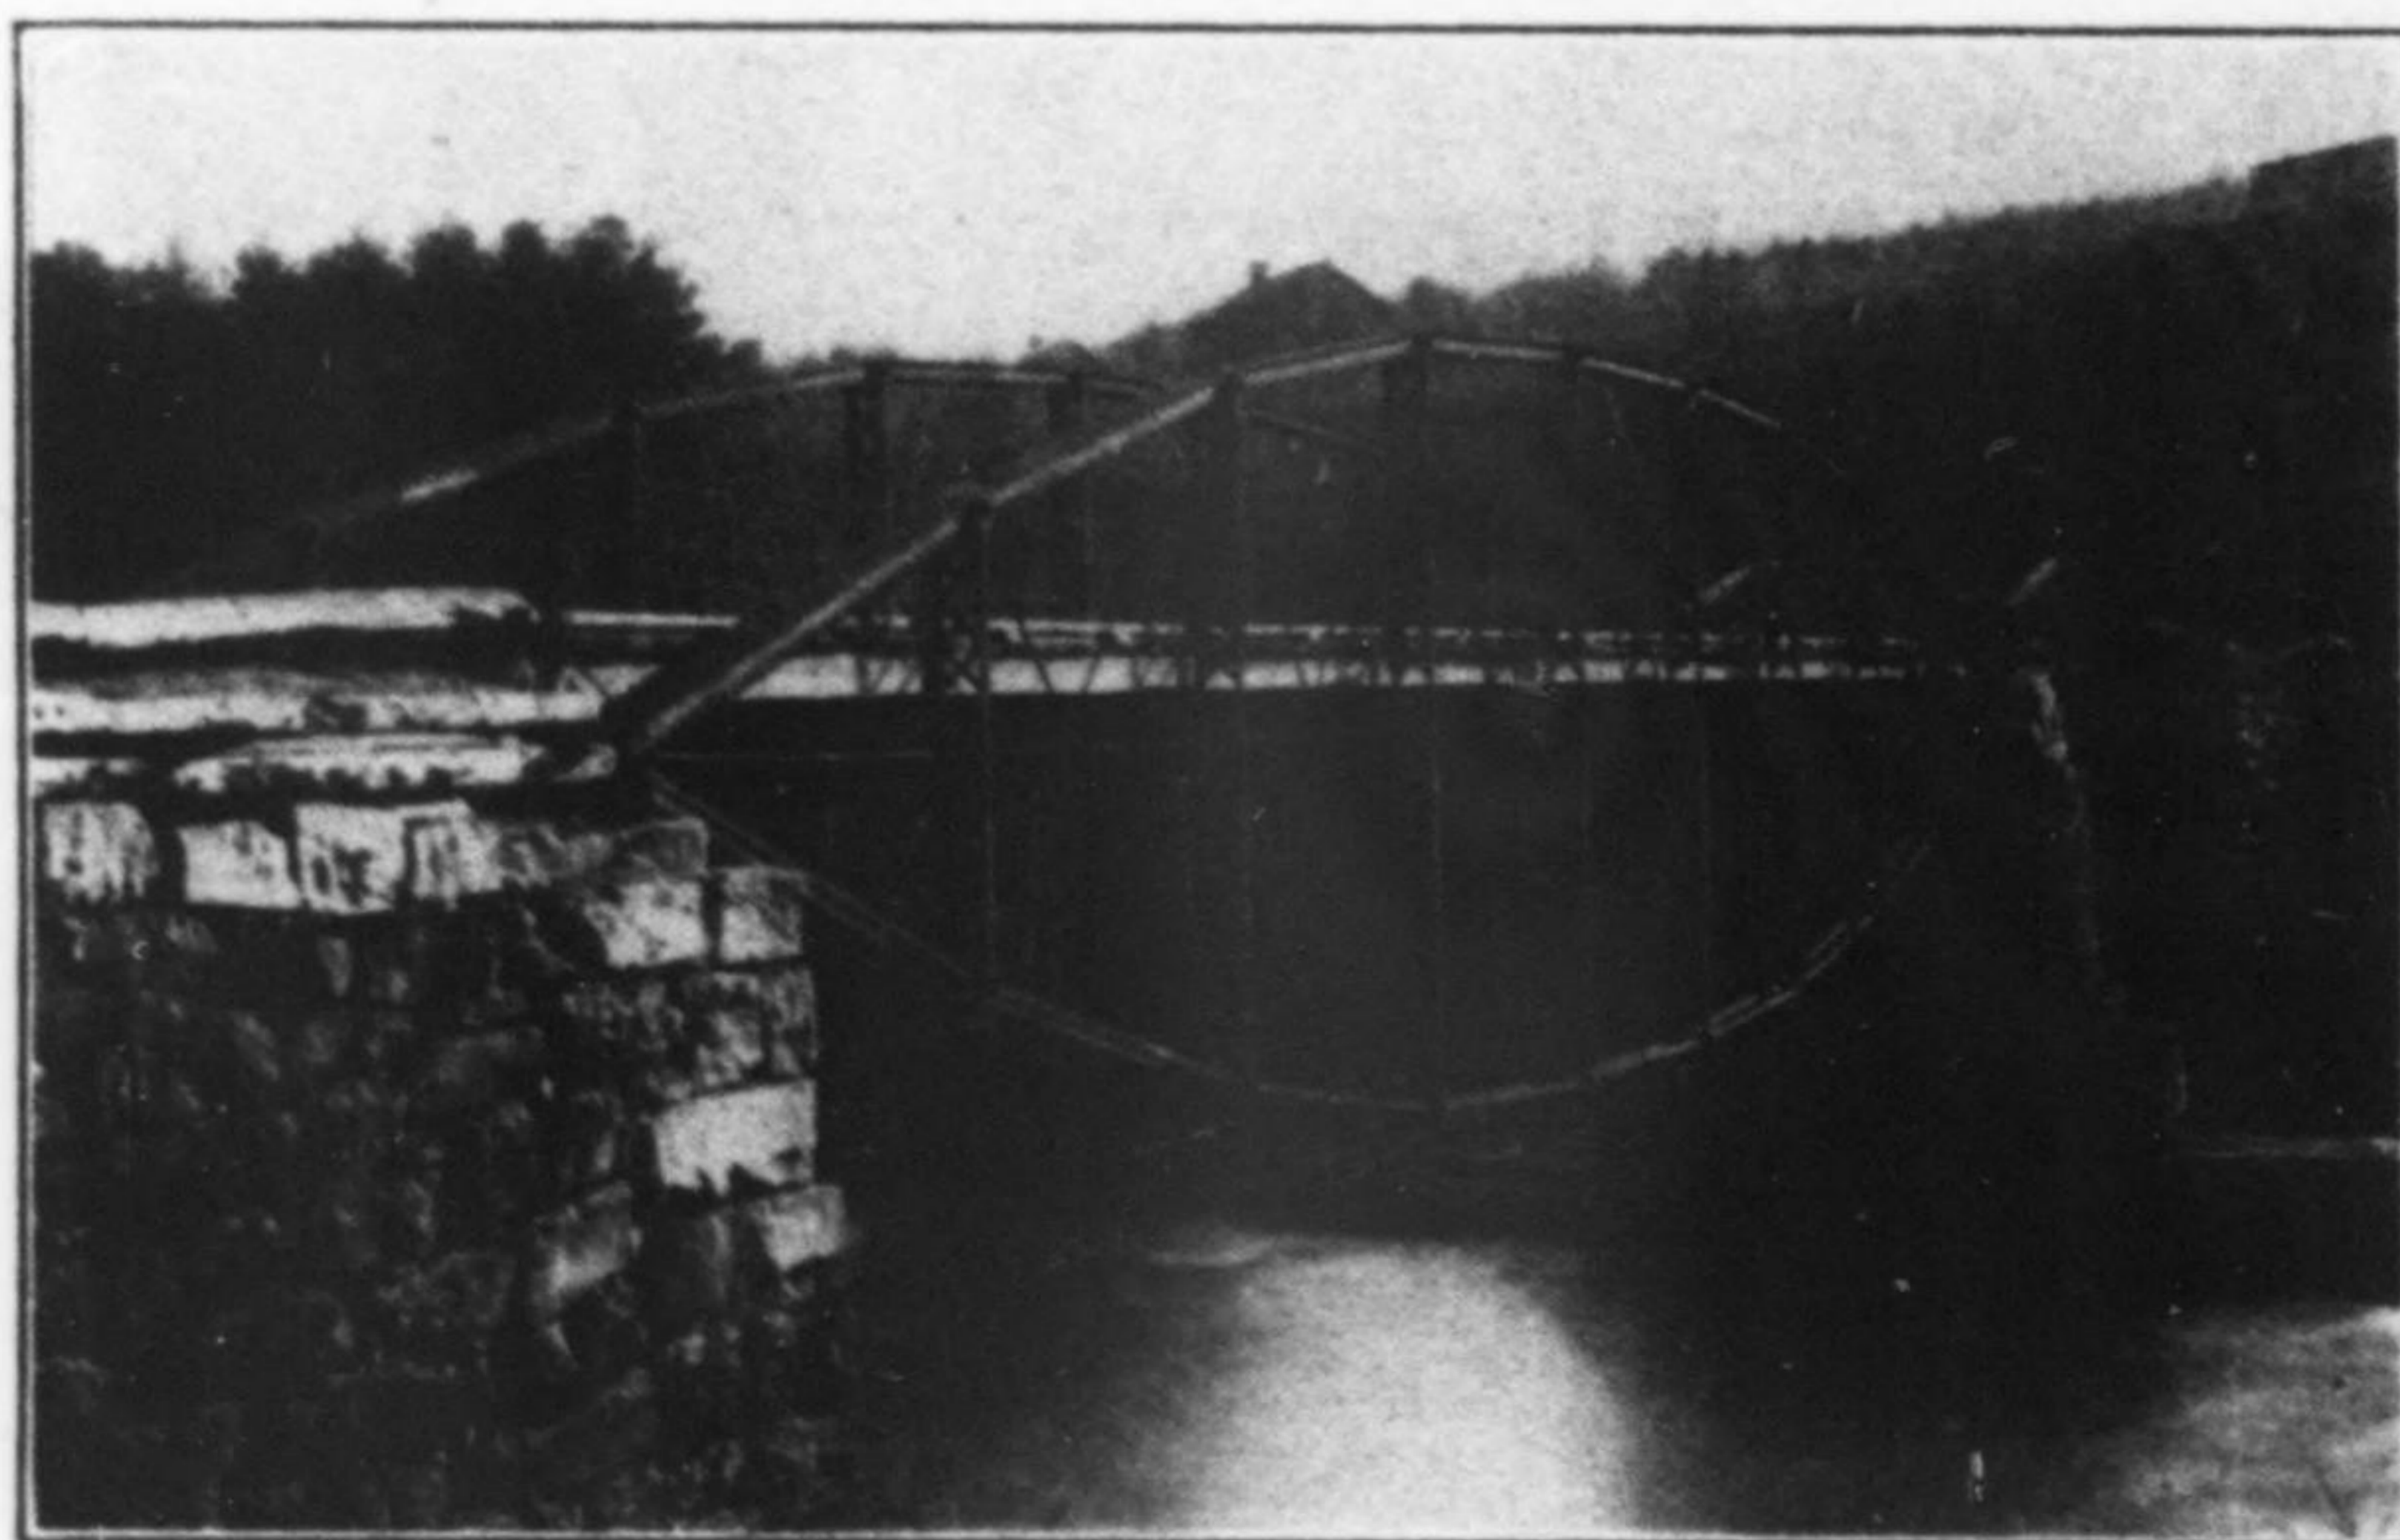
PARABOLIC TRUSS OF SEMI-DECK DESIGN
